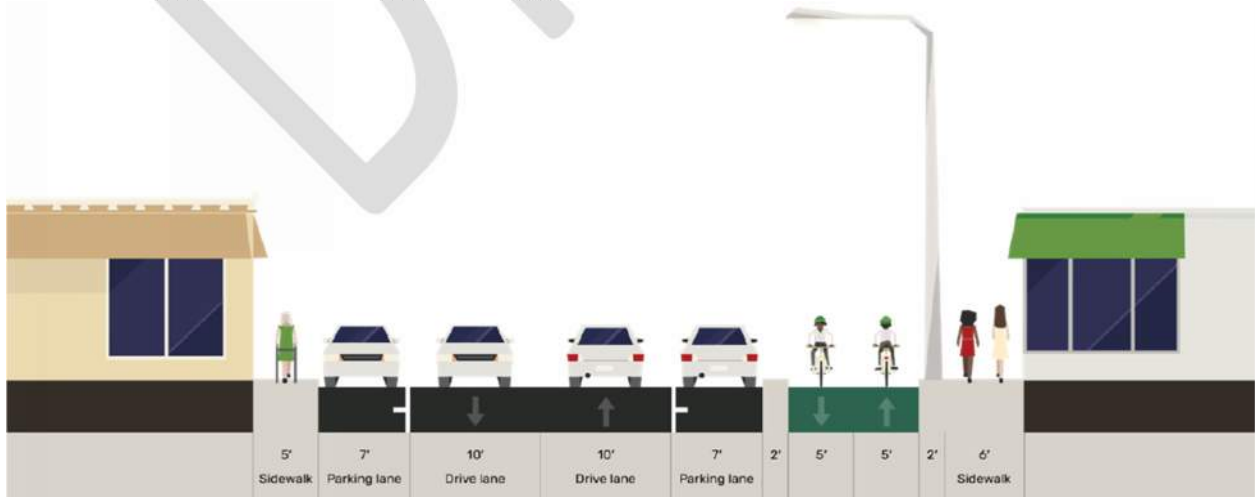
Beach Street (Eastbound) East of Walker Street to Rodriguez Street - Proposed
